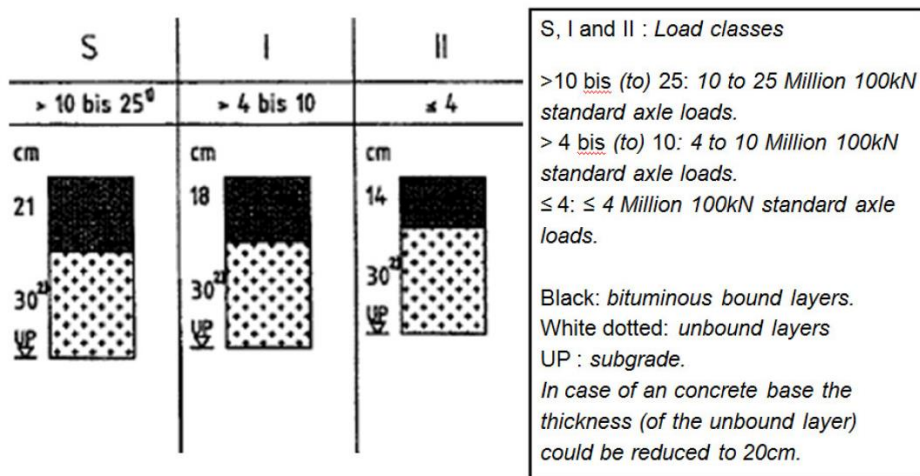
Austrian catalogue for flexible pavement design in tunnels [202] [16]
